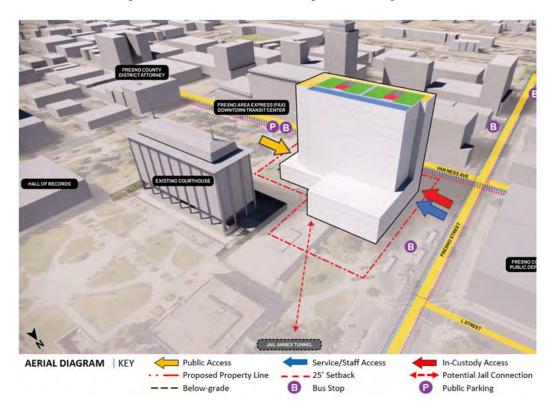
; View of Site 1B massing, looking down Van Ness Ave
